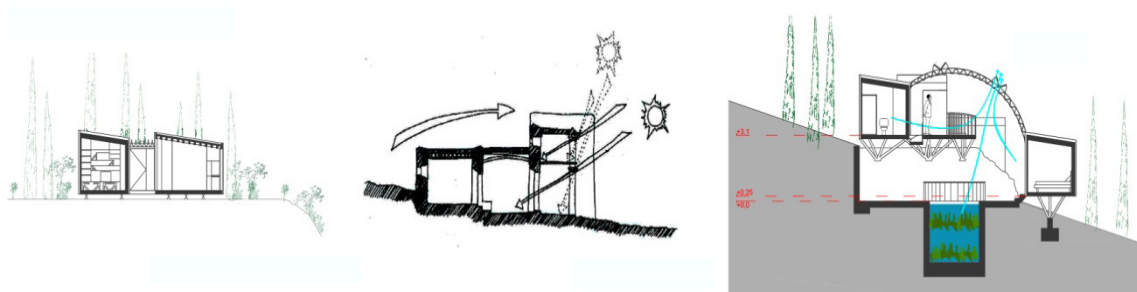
Patio House section, Andalucía Team (Case 2.2); Ibiza house section (Case 2.1); Final prototype Authors: Álvarez G. & Sampedro B.
